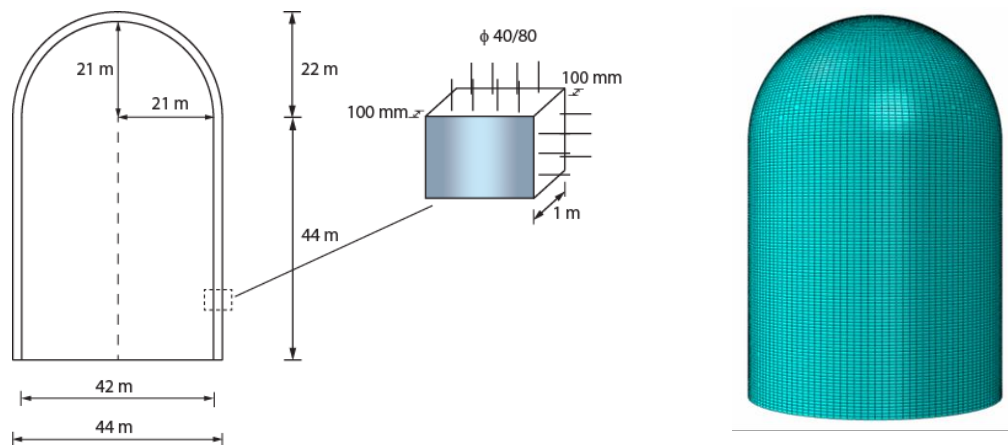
Cross-sectional view, reinforcement detailing and FE model of the containment building
